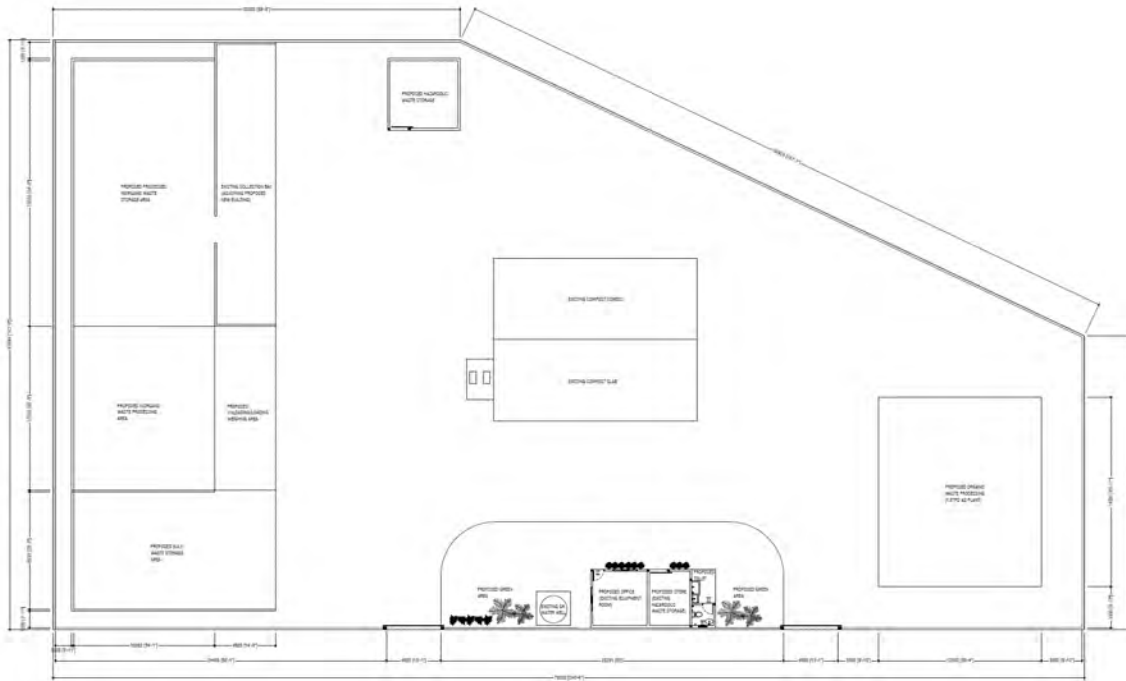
Schematic layout of IWRMC proposed (scaled site plan given in Appendix 6)
